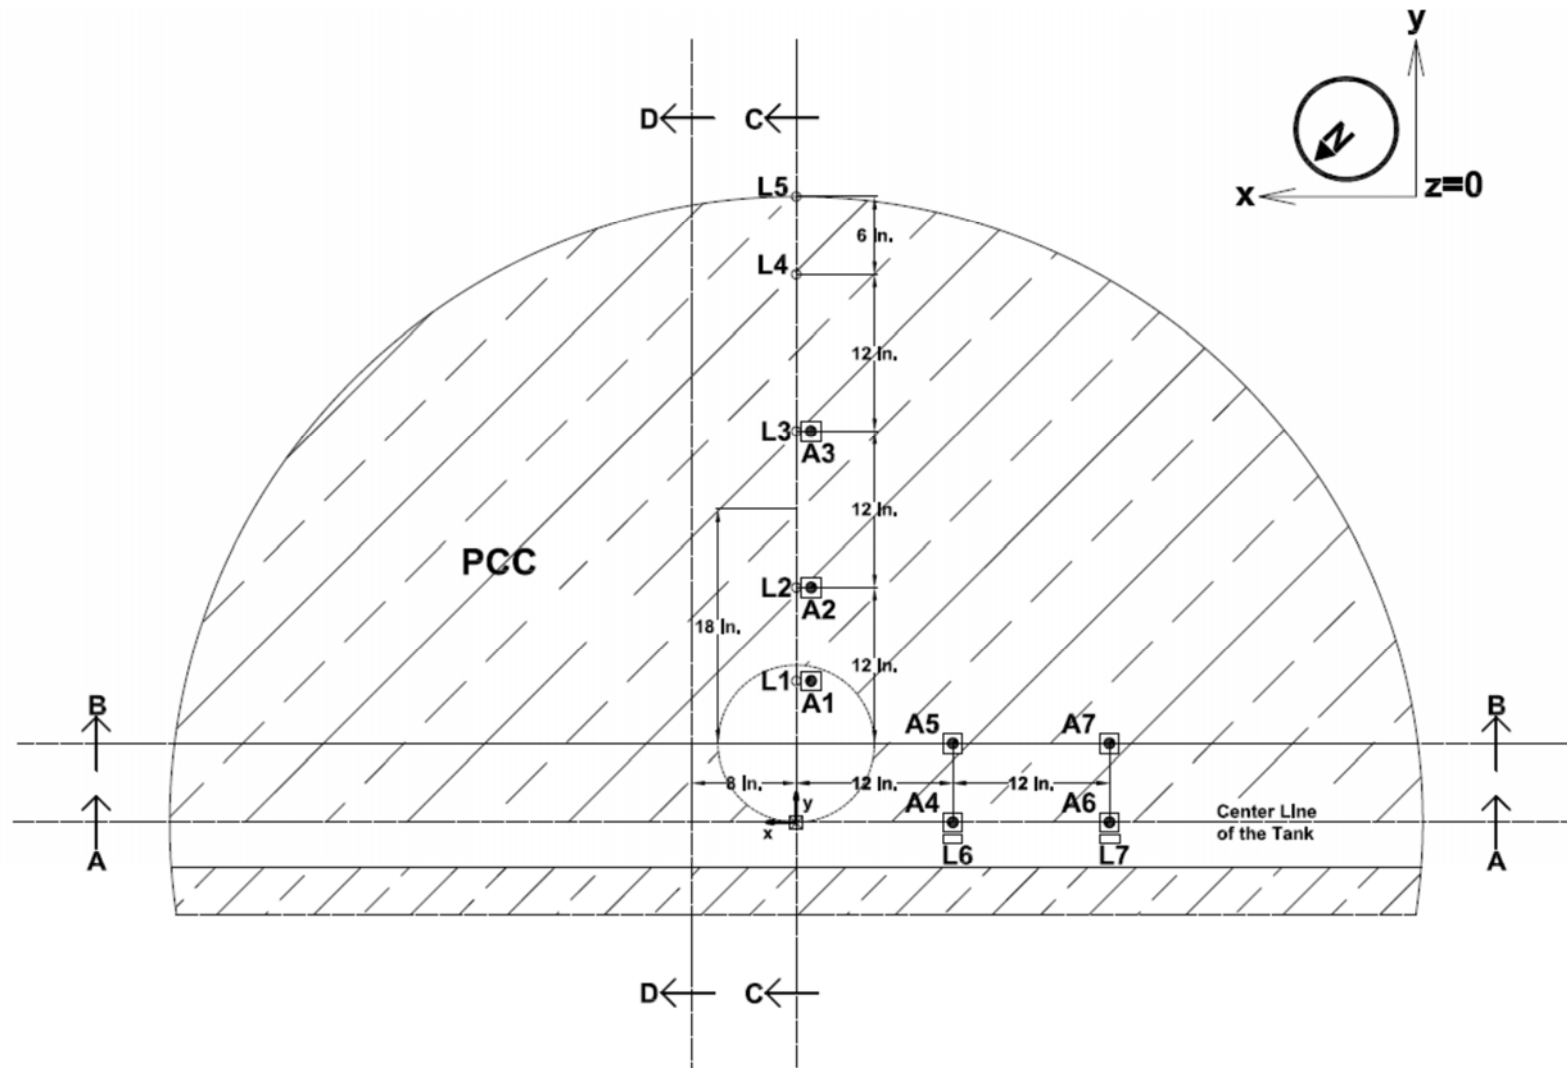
Instrumentation plan for experiment No. 10—Plan view, $Z=0$ inch
